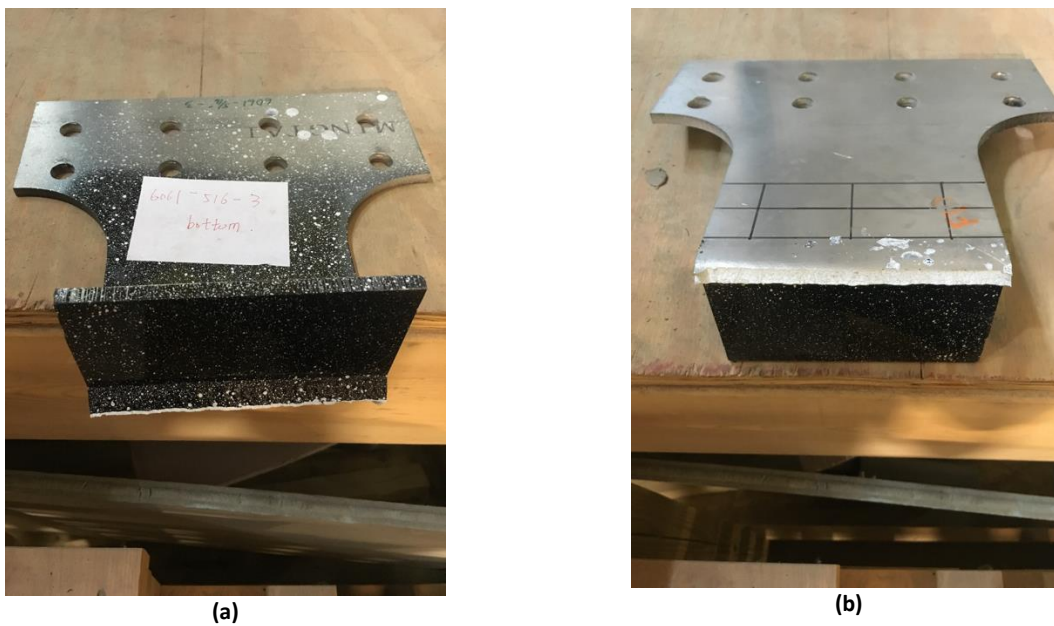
Specimen F3 Showing Failure at the Weld Toe
